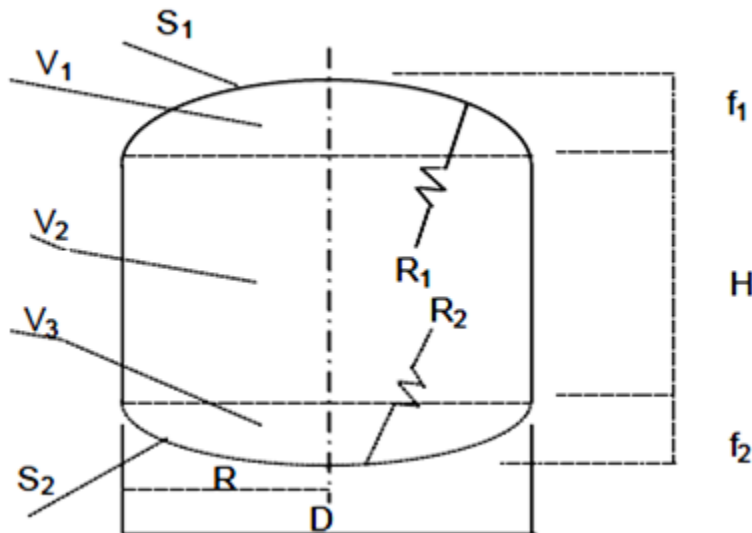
Geometrical dimension of cylindrical shaped bio digester
